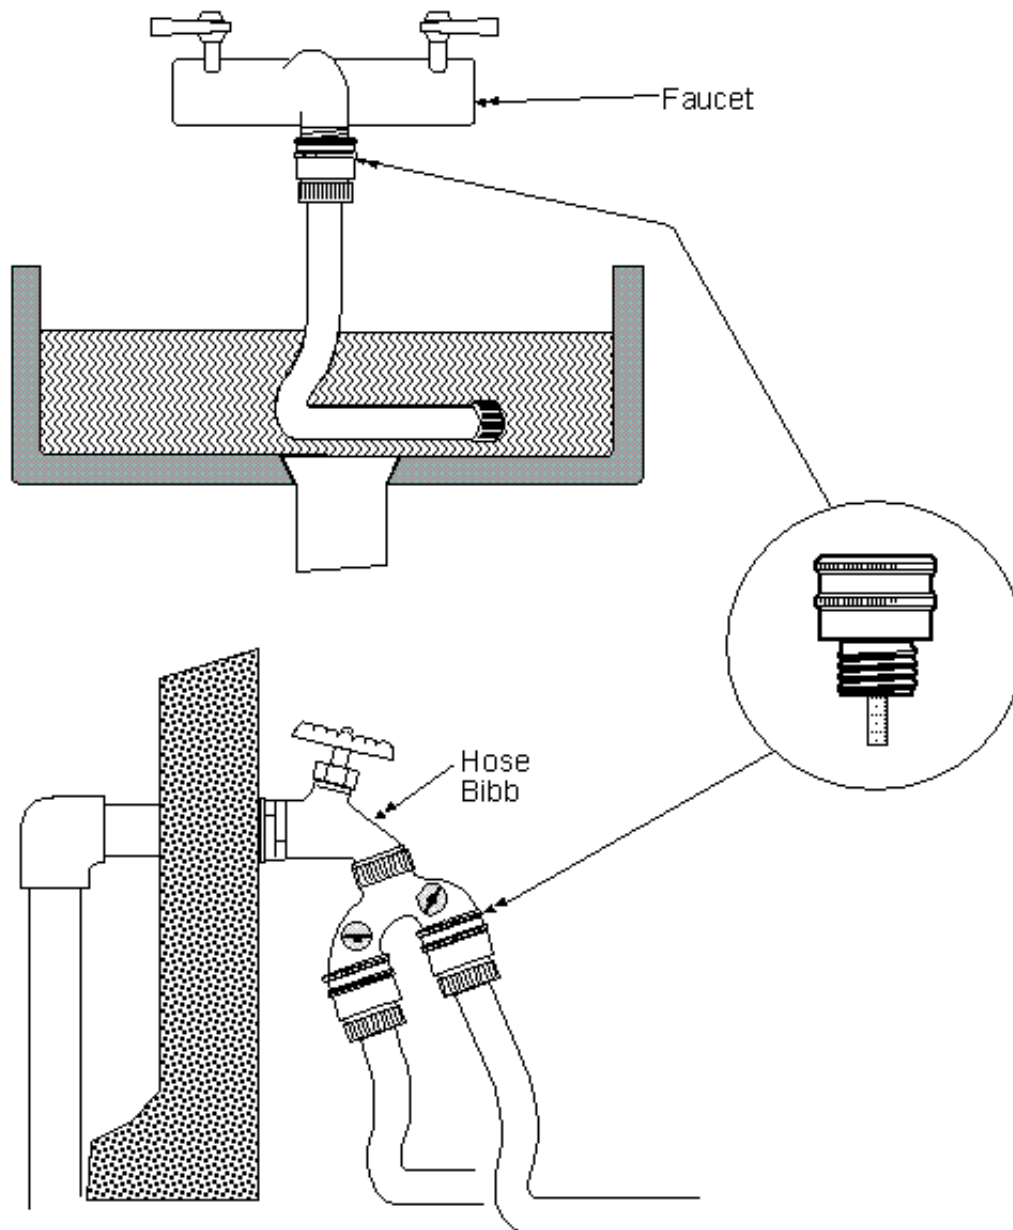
Properly Installed Atmospheric Vacuum Breaker (AVB)
